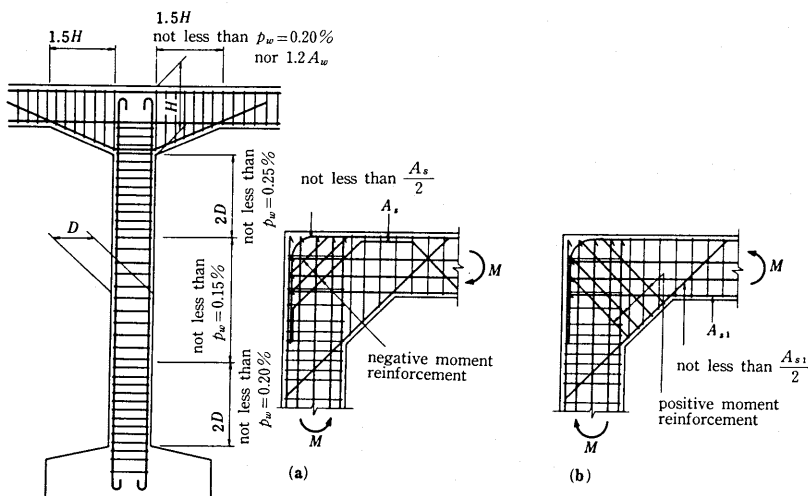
Placing of reinforcement at the middle node of frame system
